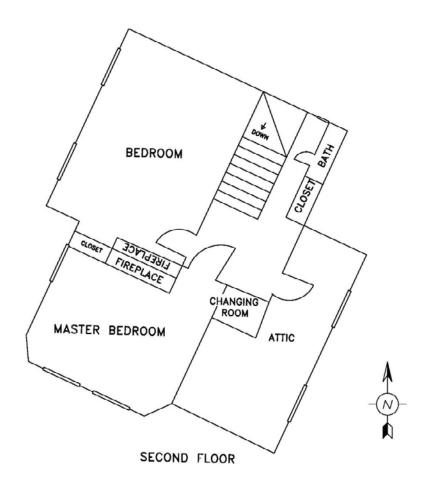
Queen House Floor Plan, Second Floor (Not to Scale)
